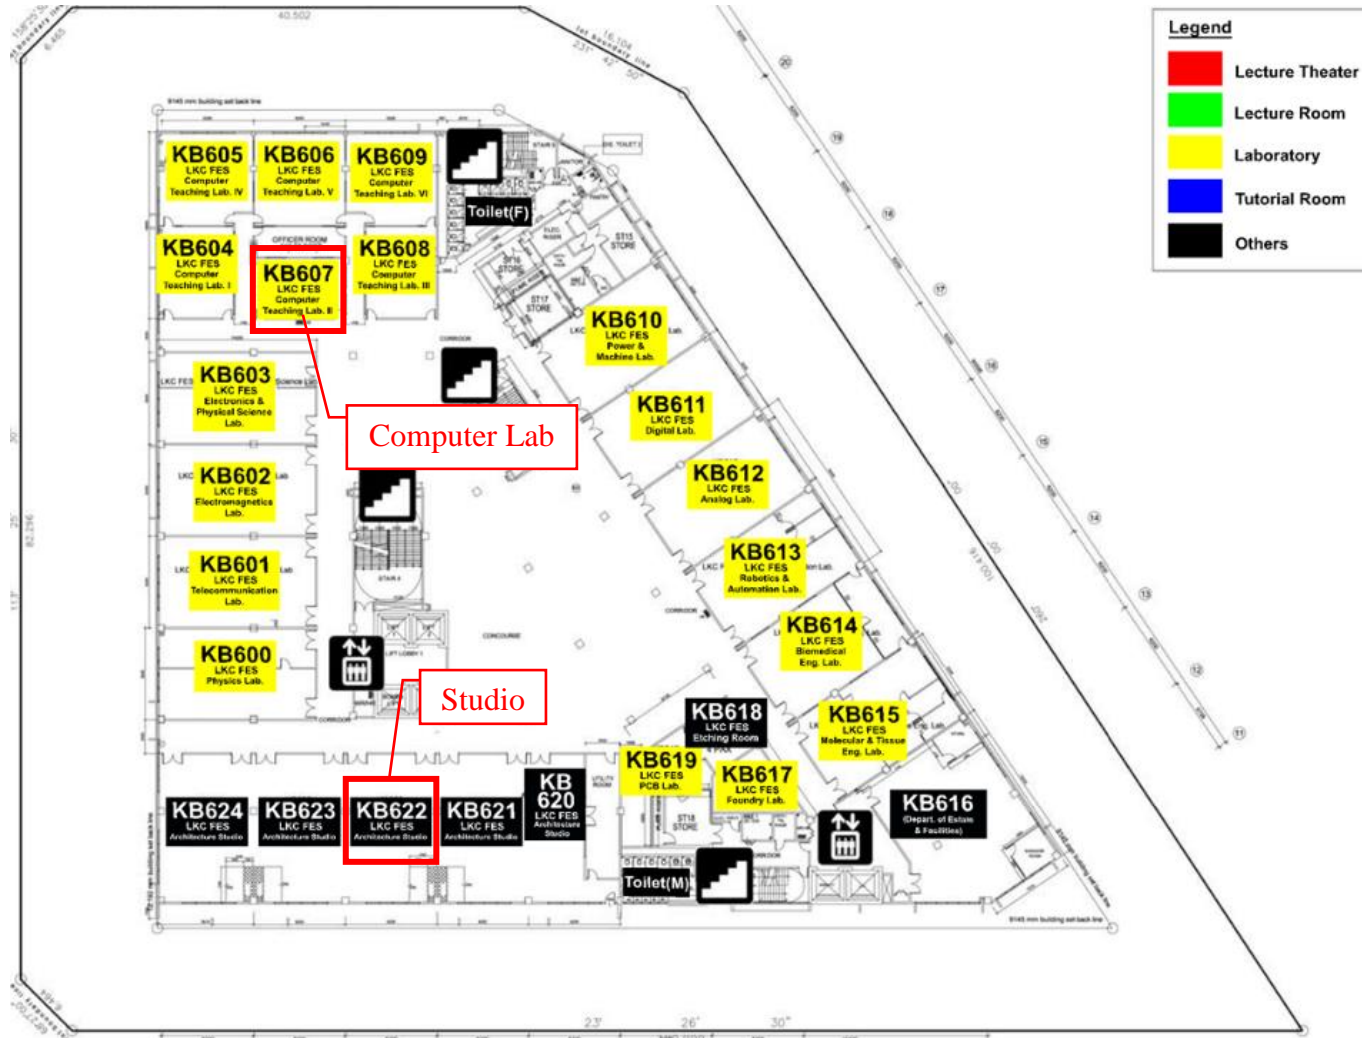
Sungai Long KB building floor plan – 6th floor.
